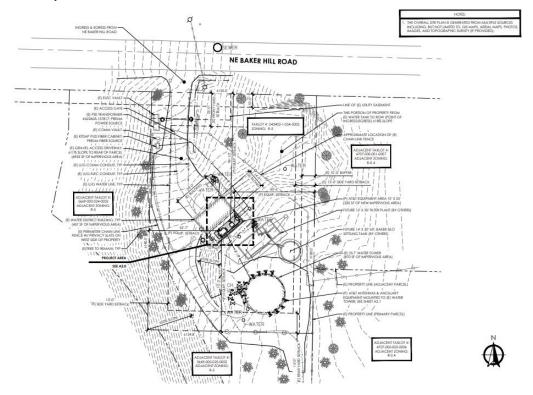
Vicinity Map, Surrounding Zoning, and Project Site
